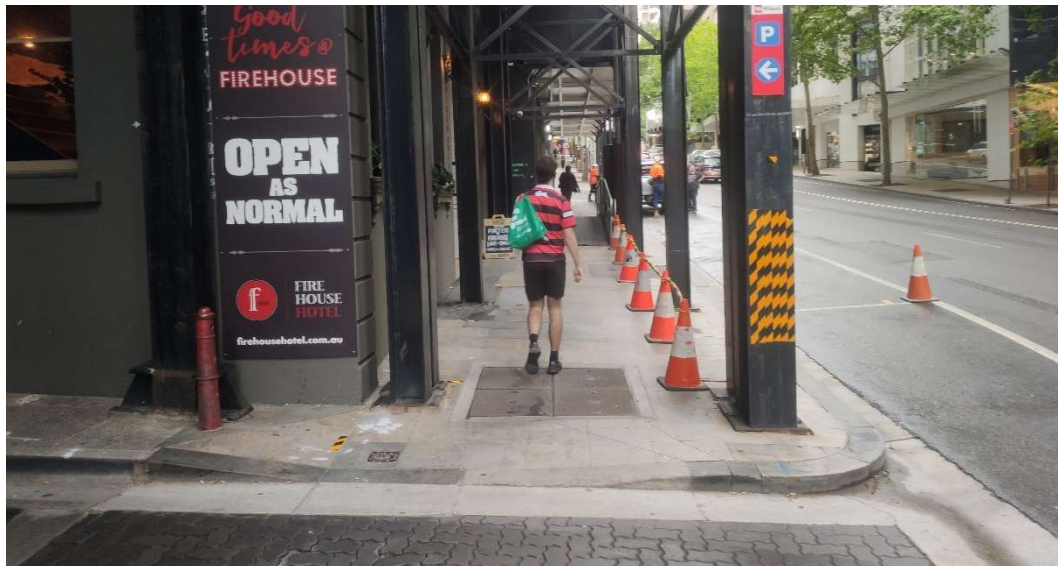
88 Walker Street measurements showing the temporary construction hoarding posts
